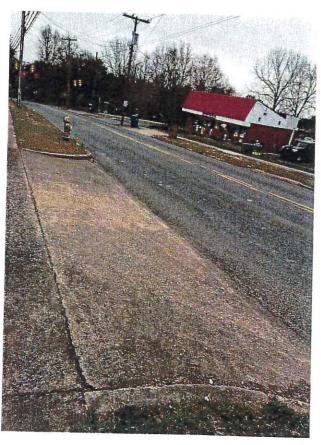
A: Sitework sub to remove the wall. Image 3B
